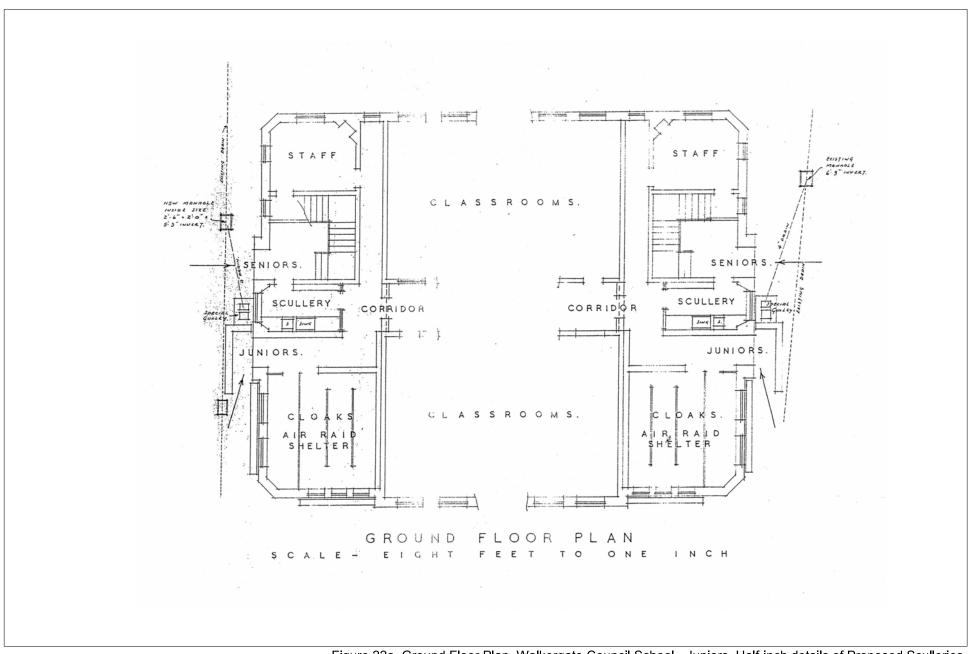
Ground Floor Plan. Walkergate Council School - Juniors. Half-inch details of Proposed Sculleries August 1943. F.W. Harvey, Education Architect for Newcastle-upon-Tyne Education Committee
